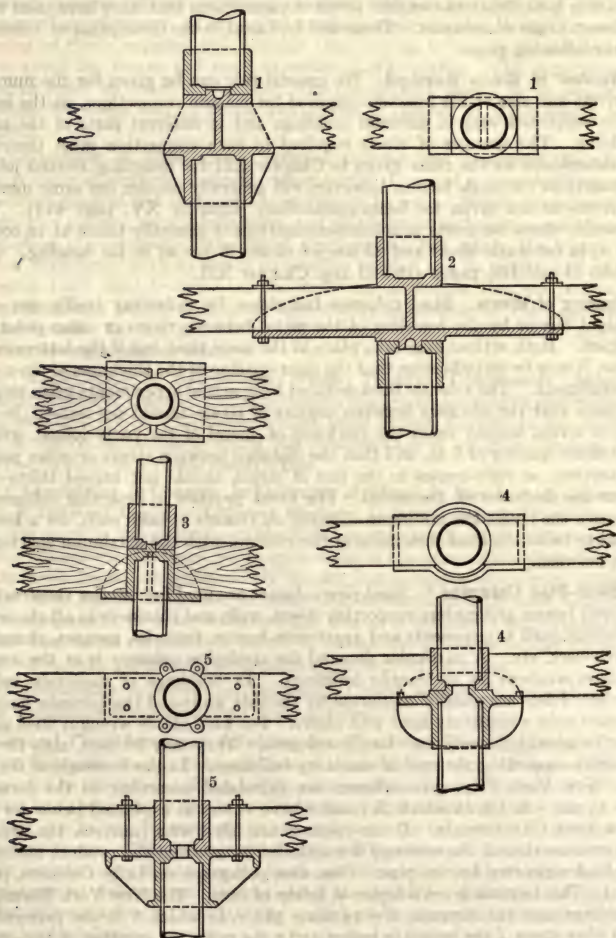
Connections, Caps and Bases for Steel-pipe Columns
